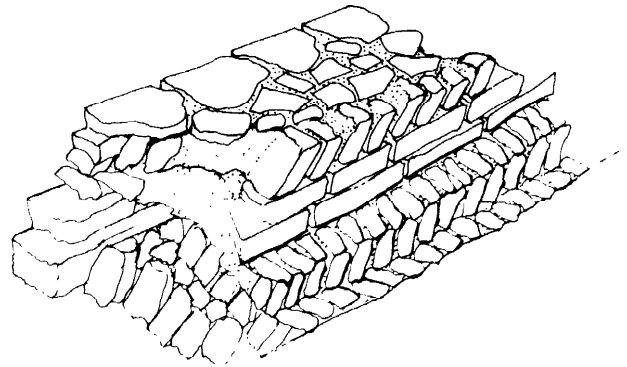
Limestone herring-bone walling, typical construction with tabular string courses (D S Neal)
